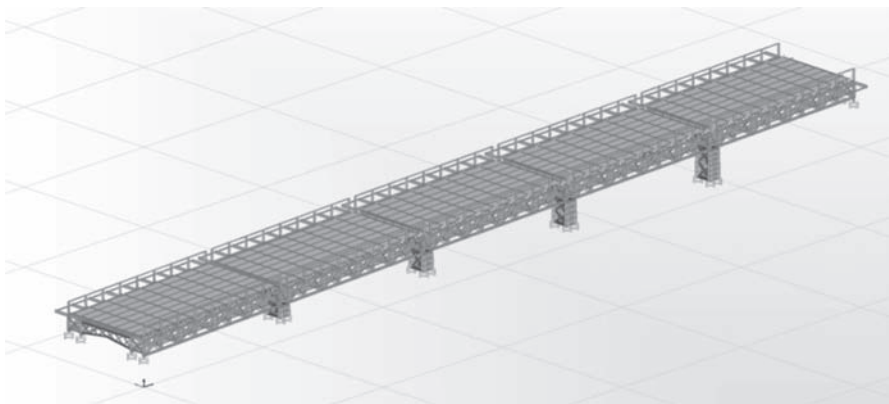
3D Finite element model for truss spans in Philadelphia approach.
